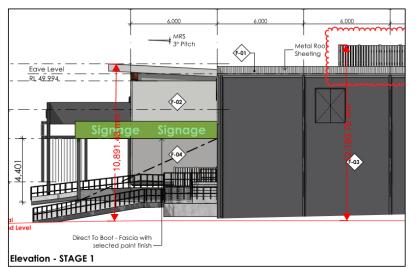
Height of building for stage 1 (western elevation, showing the direct to boot roofing and roof plant screening)
